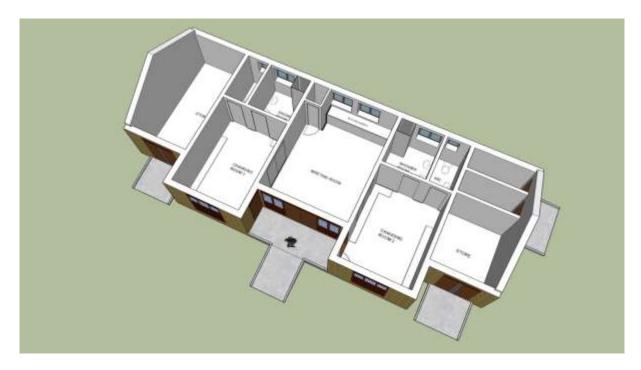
Dan showed that by taking out the current changing rooms, and adding a 1 metre wide additional strip at the front of the building, to extend the width, the internal space could be reconfigured to provide:
